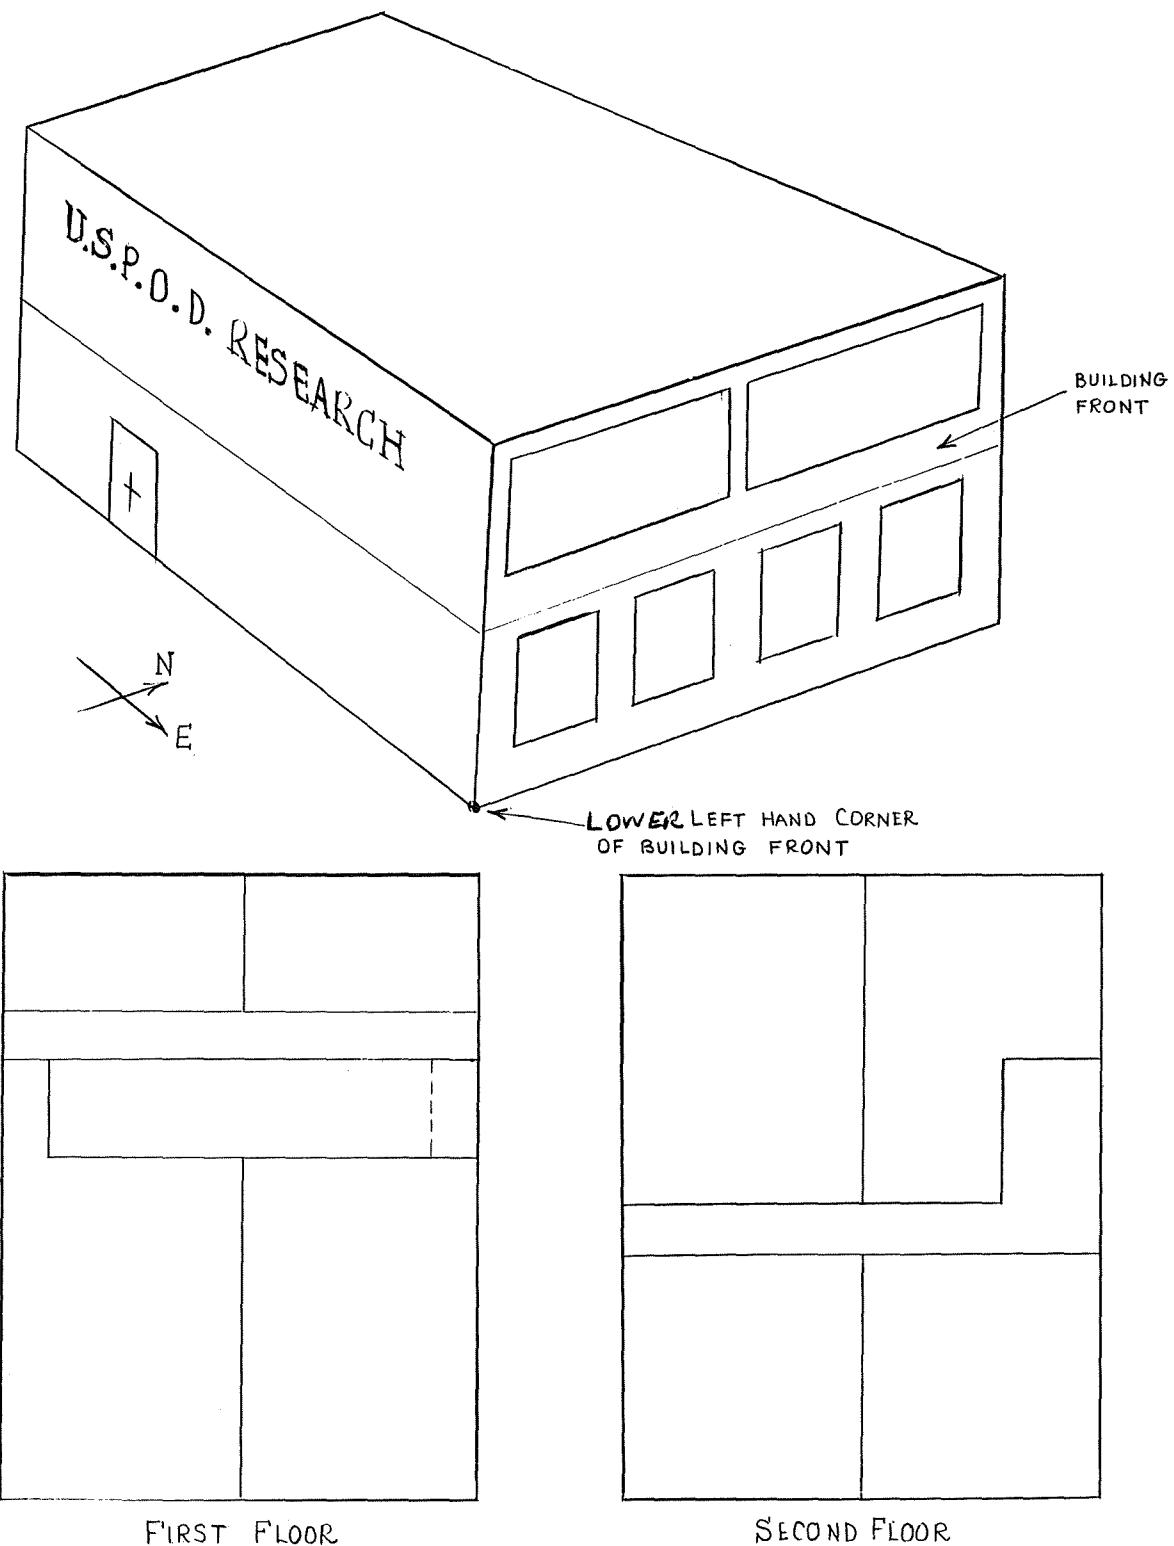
ISOMETRIC LINE SKETCH AND FLOOR PLANS OF EXAMPLE BUILDING
